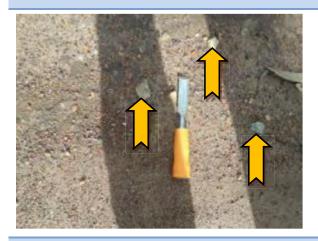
Section 32 – Area B, external, central area, debris – asbestos fibre cement sheet. Reference: 17069-001-026.
